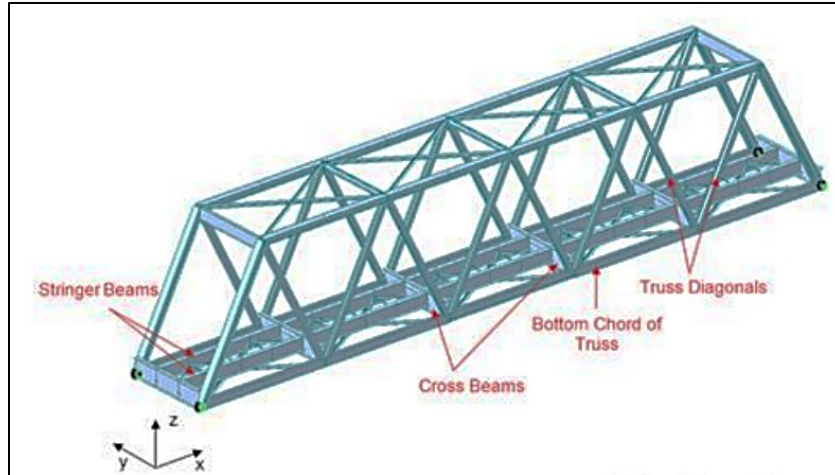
Structural configuration of Nieporęt truss bridge, Poland (Favai et al. 2014)
